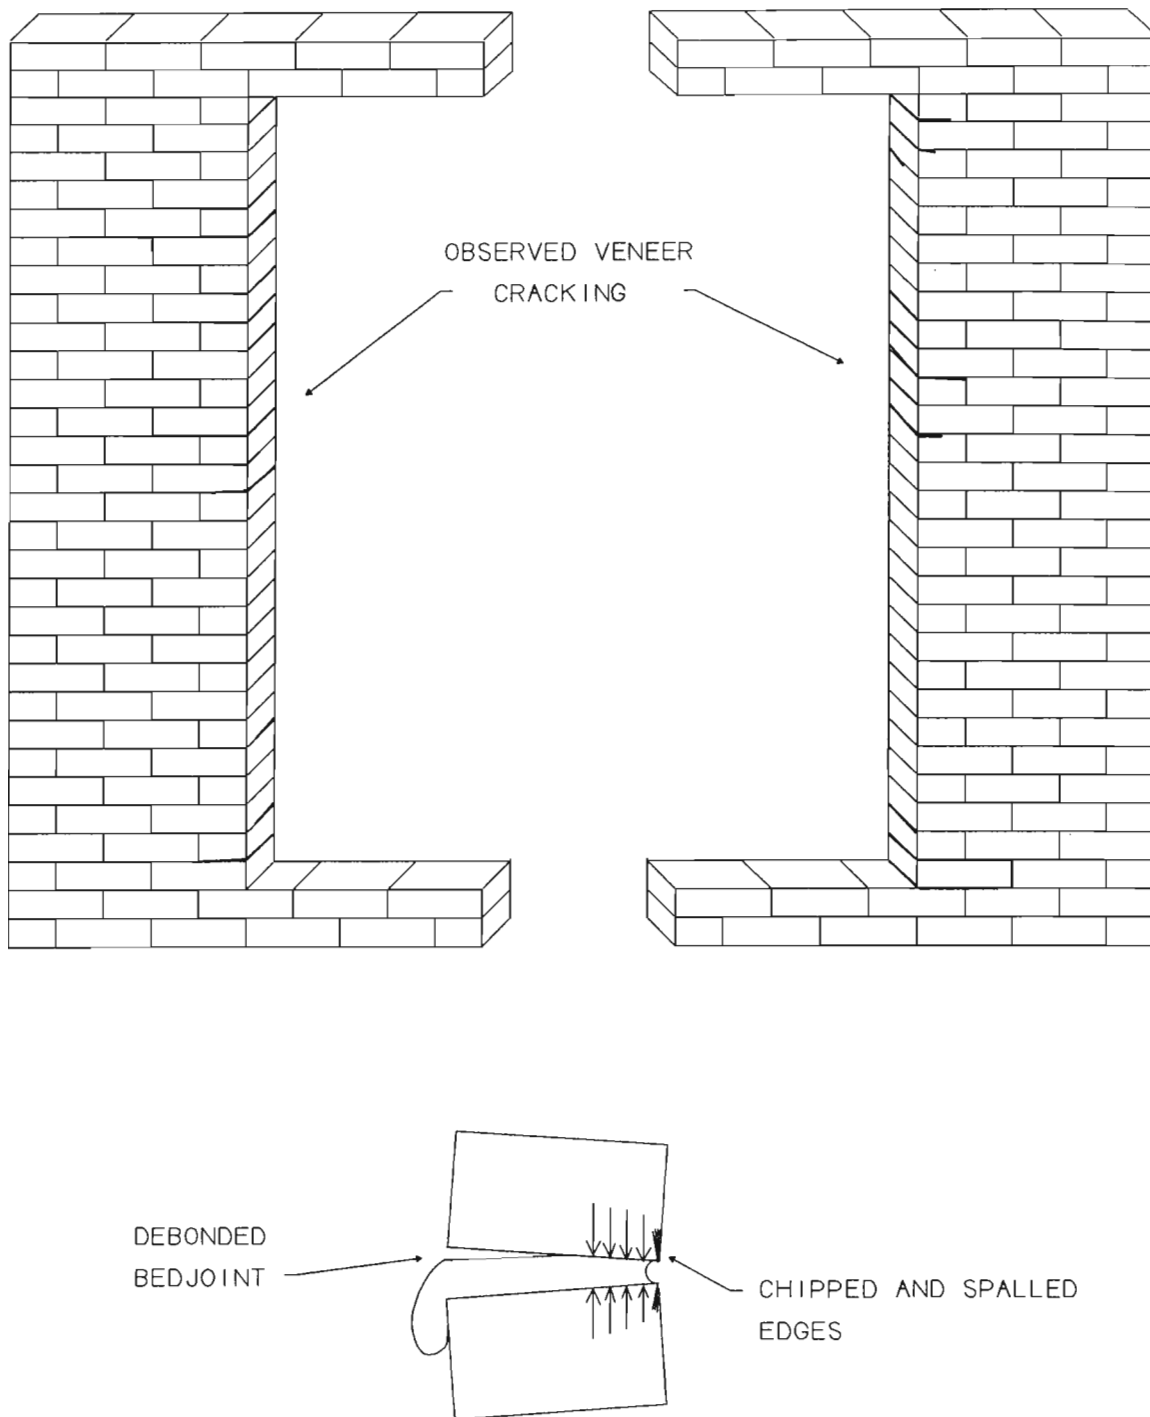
VISIBLE SIGNS OF CRACKING AROUND WINDOW IN WALL4
